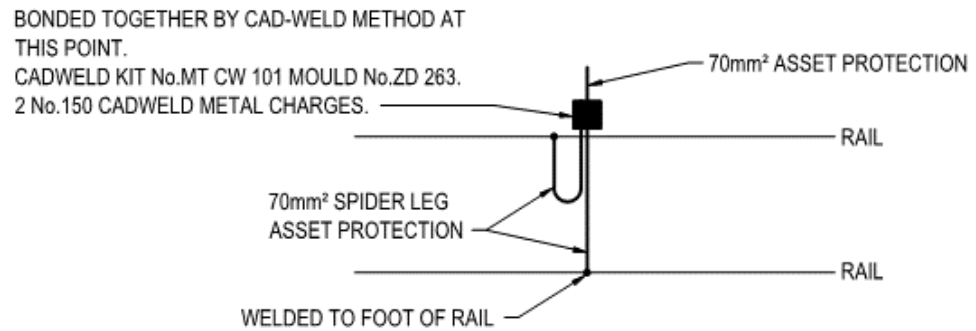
Typical Asset Bond Connection Detail
